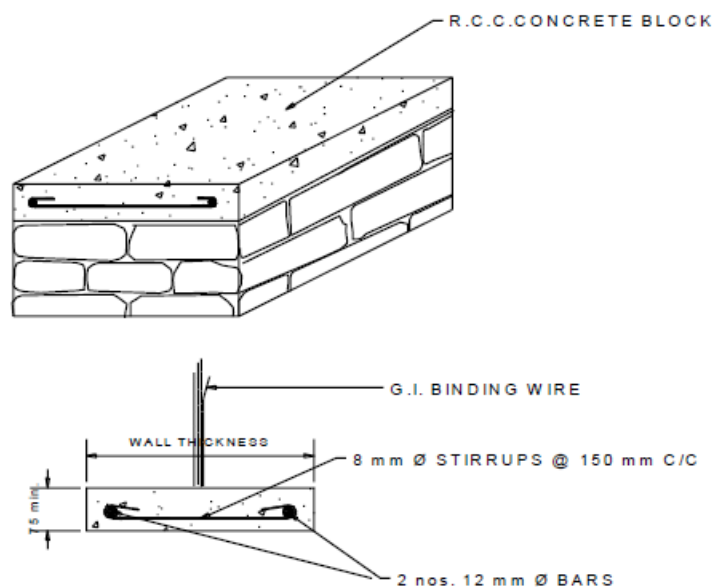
Details of Fixing Wall Plates (where concrete and steel are available)
